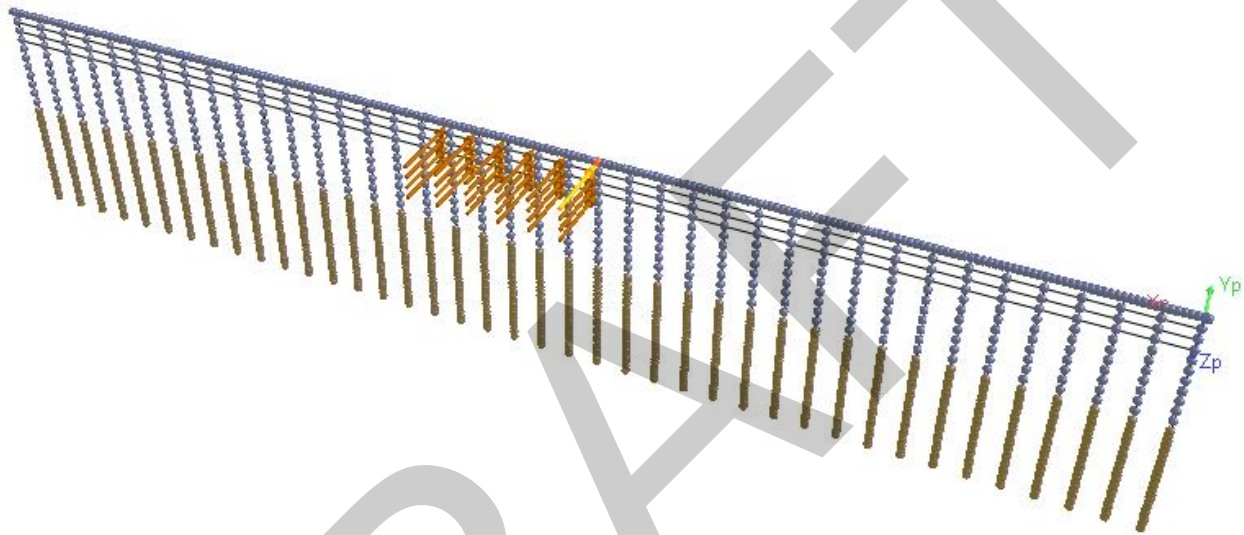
Layout – Load Case 1 (Section 1 – Soil C2)
